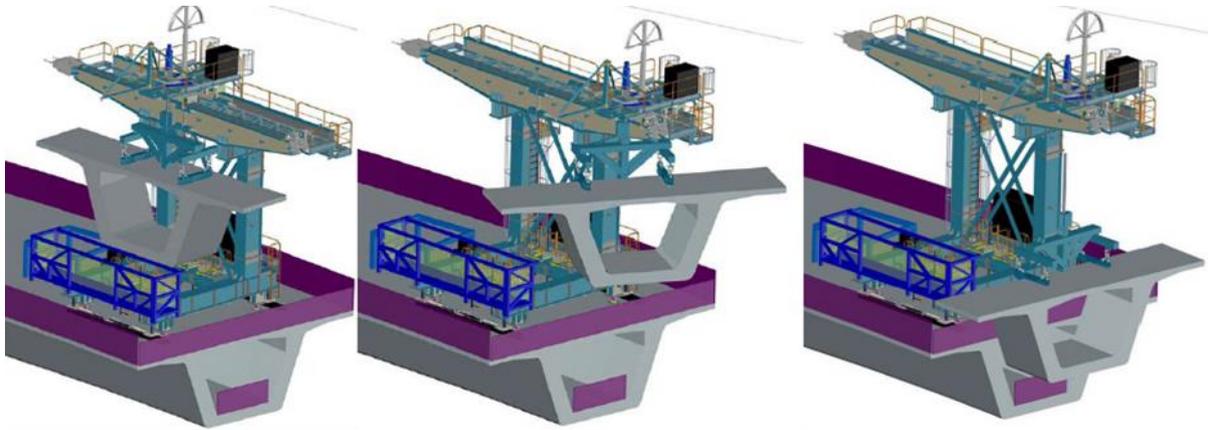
Installation of Precast concrete Segments using Lifting Frame
